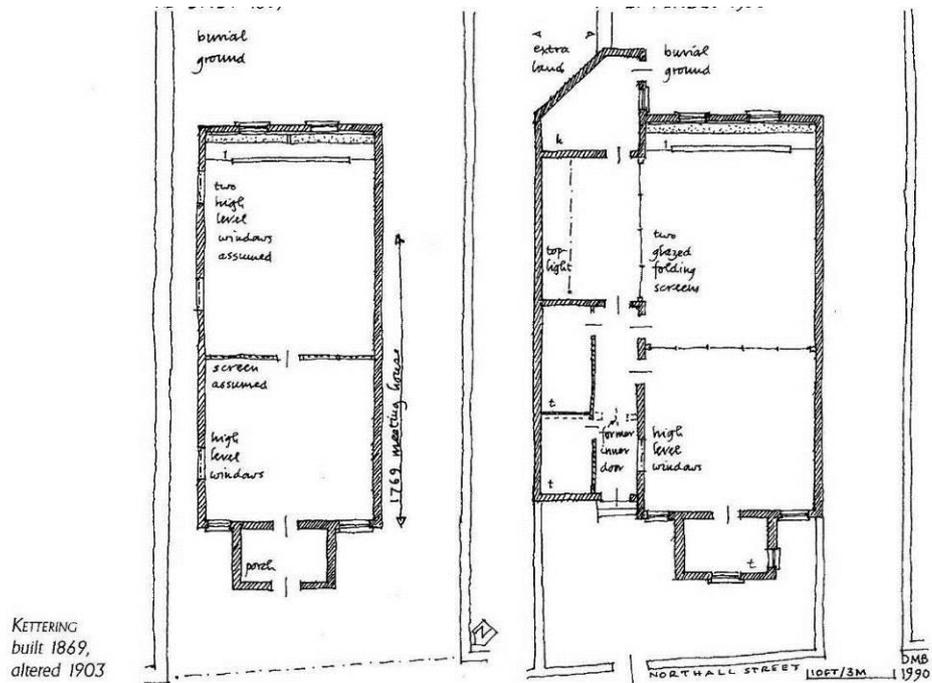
The plan of the 1869 building (left), with the plan as altered c1903 (right) Butler 1999 vol.1 p.468. North is at the top of the plan.
